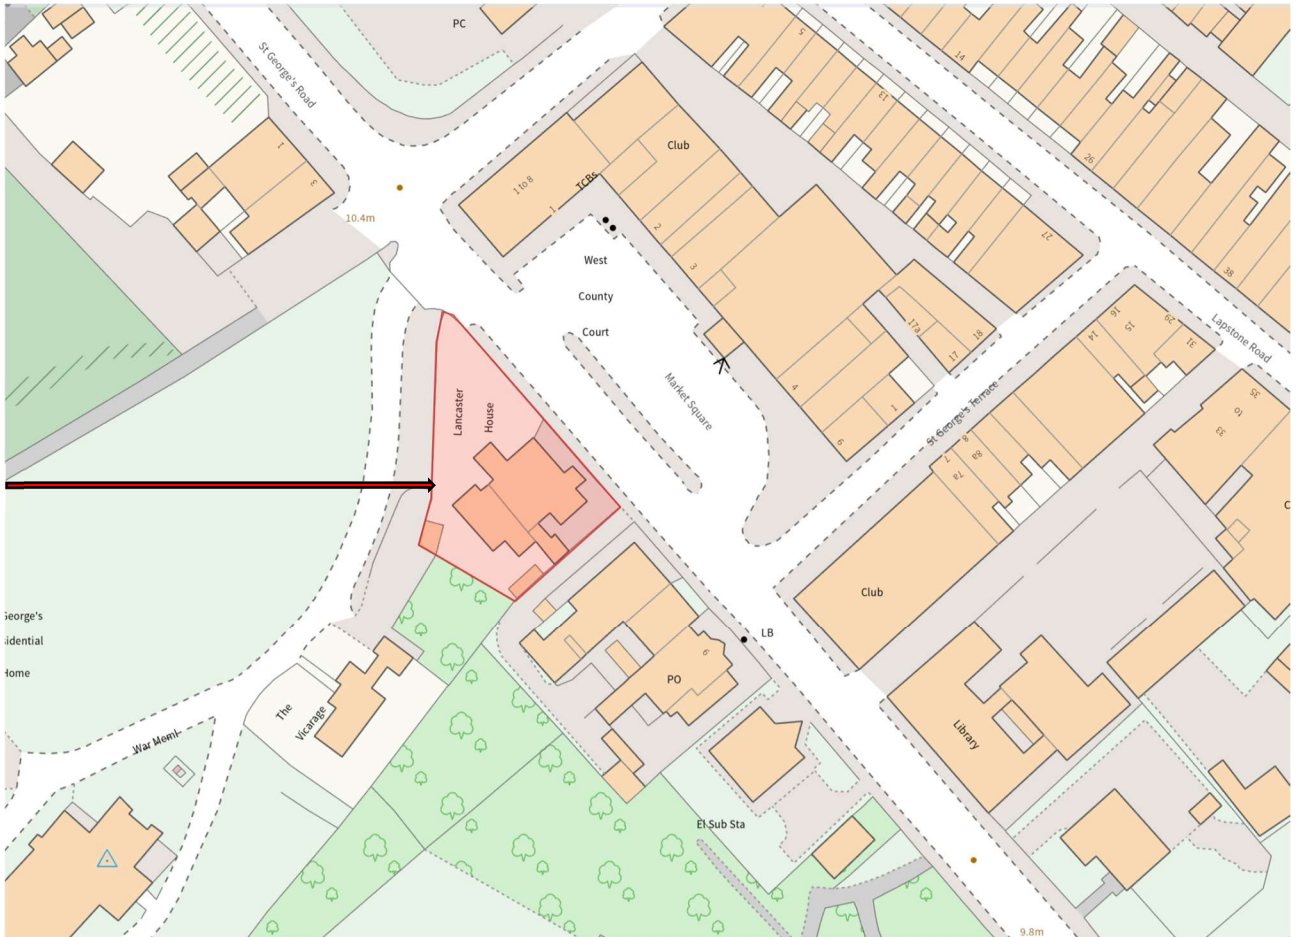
Site location plan showing the context of the adjacent buildings and trees.
